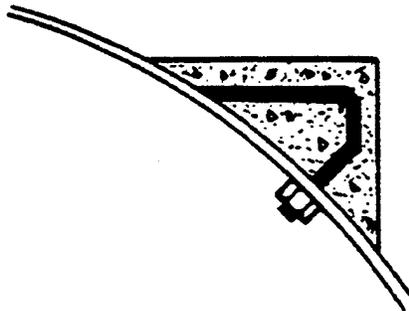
Concrete thrust beam used as a longitudinal stiffener
